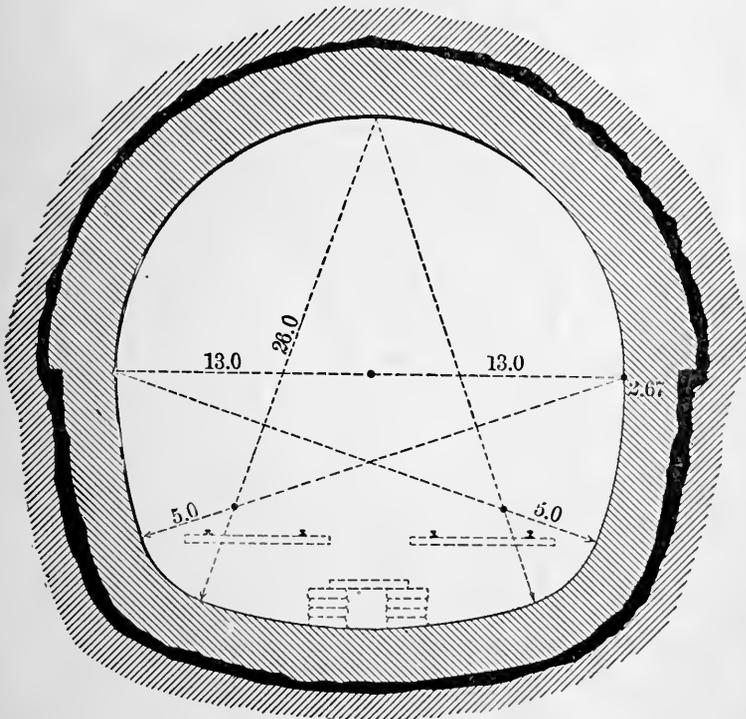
HOOSAC TUNNEL. SECTION THROUGH SOFT GROUND.
